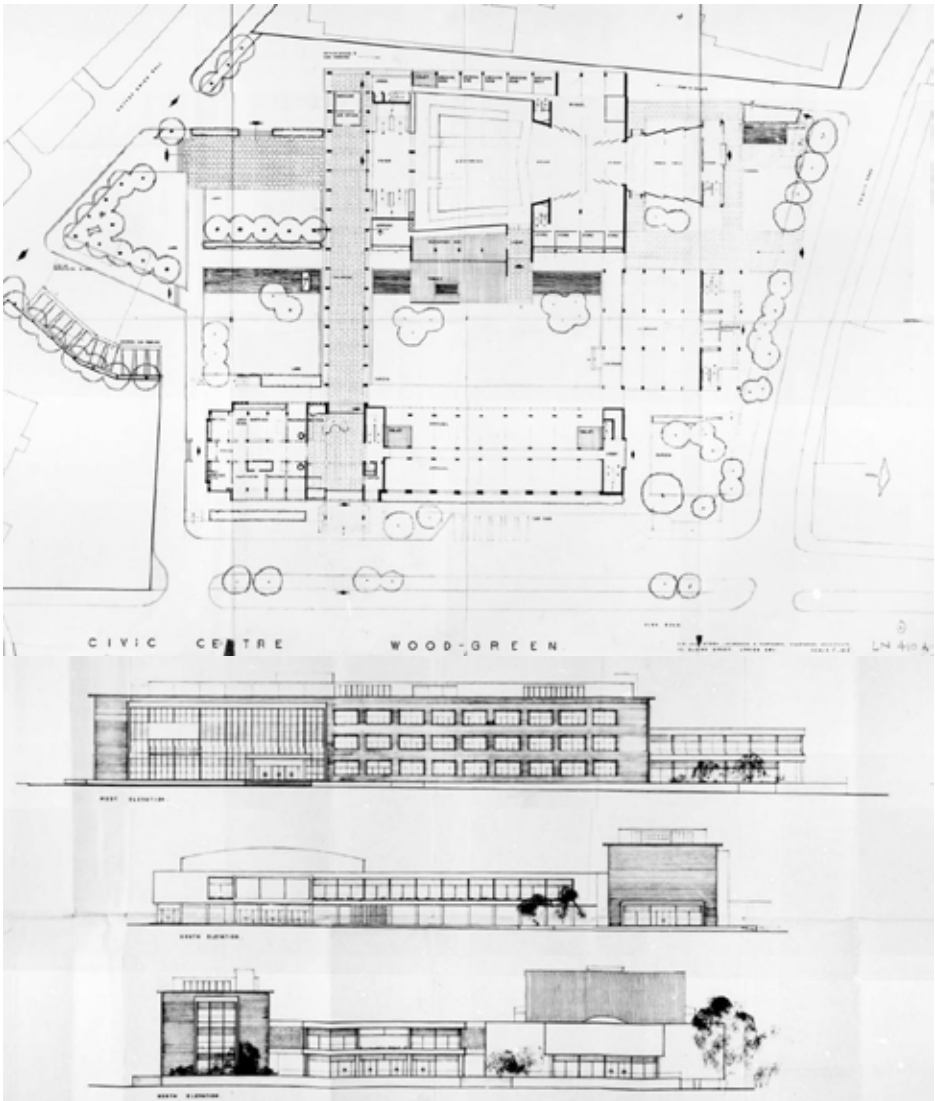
Ground floor plan and sections for the original proposals at the Civic Centre site (Application refs 11/28 and 11/97)
